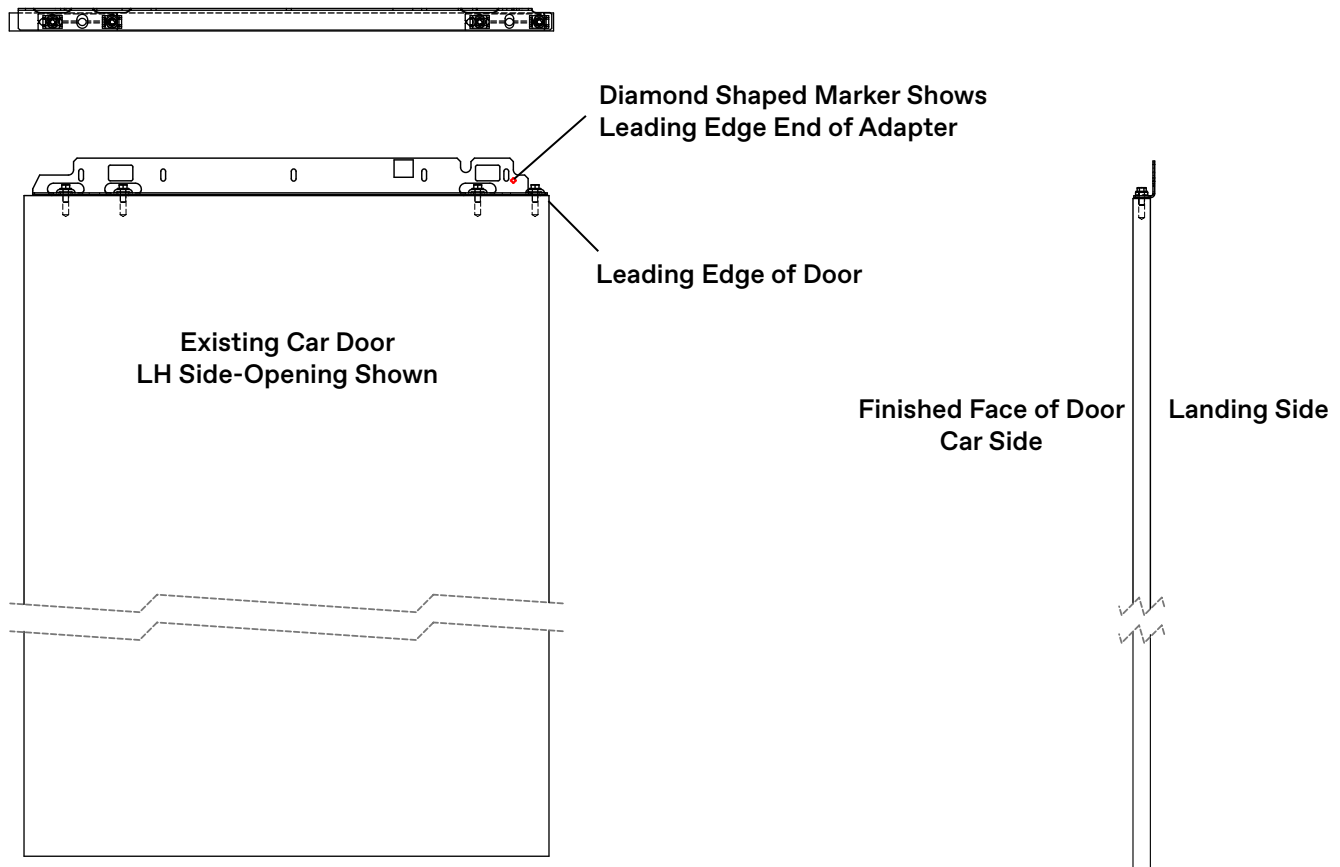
Assemble and Align Door Panel and Angle (1 of 2)
